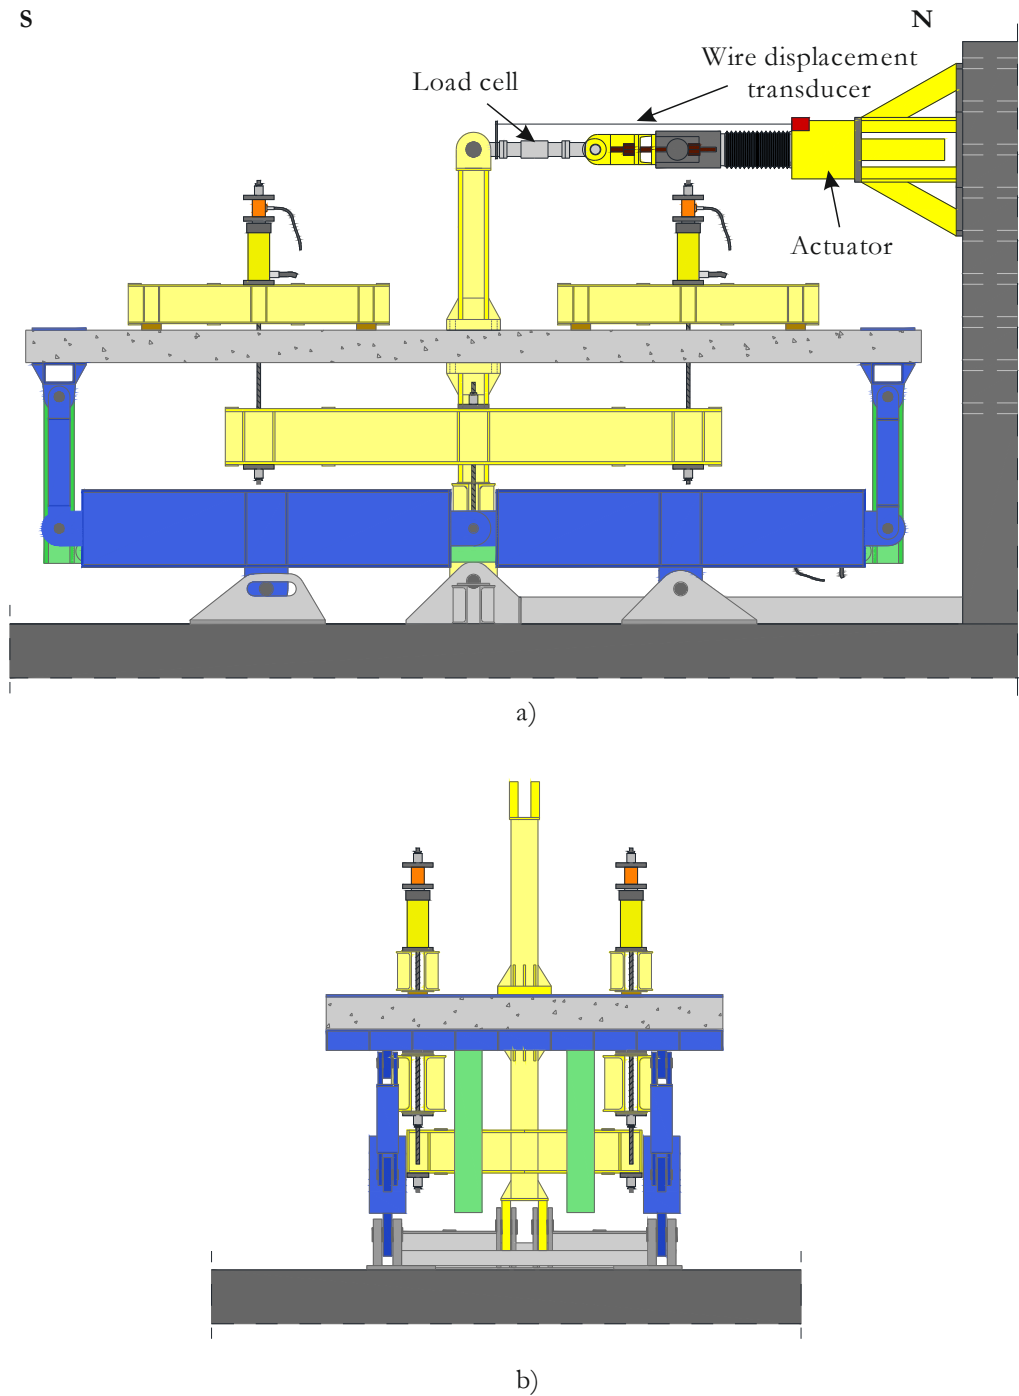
Scheme and detail of the complete test setup. Unloaded specimen. a) Side view; b) Front view.
